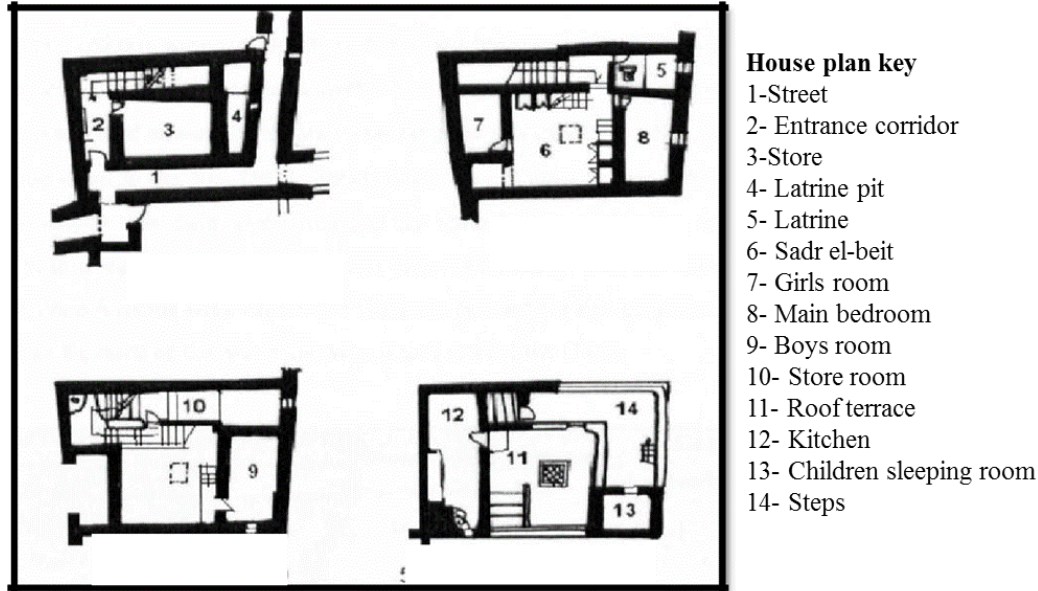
The dwelling as a traditional house in Ghadames (Chojnacki, 2003)
